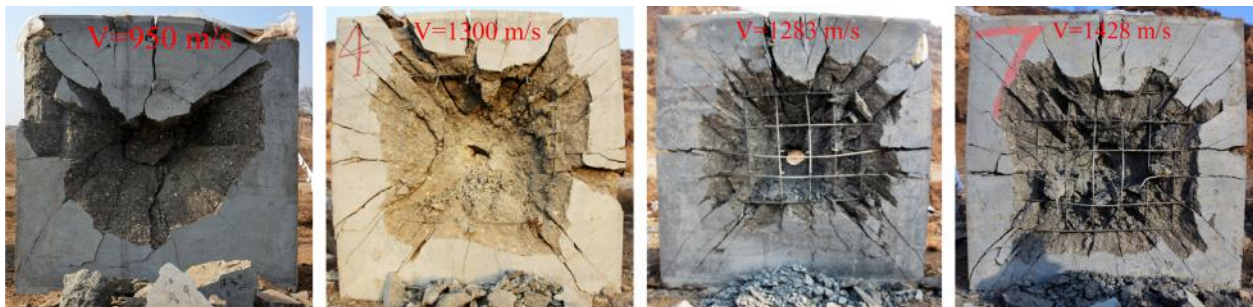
Typical experimental results of the perforation of concrete and reinforced concrete slabs.
